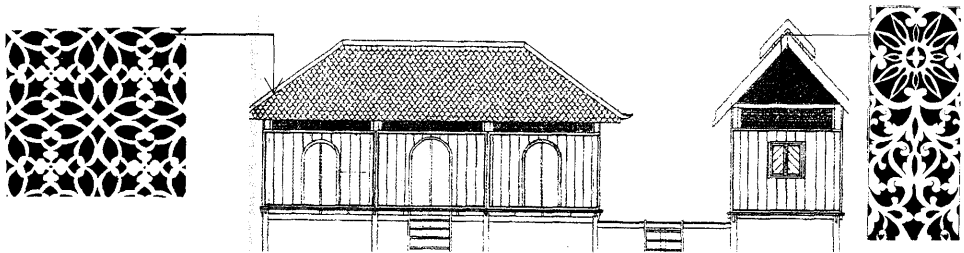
Carved ventilation panels fitted above the bedroom's door of Hassan Yusof house
